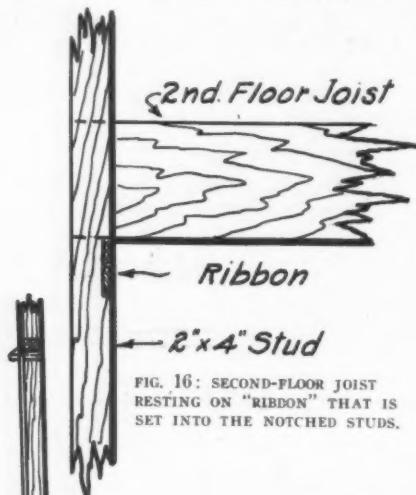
SECOND-FLOOR JOIST RESTING ON "RIBBON" THAT IS SET INTO THE NOTCHED STUDS.
